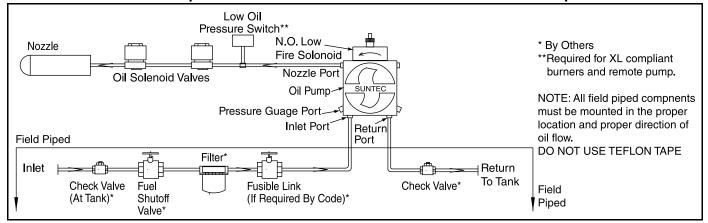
Webster 3450 RPM Blower Motor Driven Oil Pump
